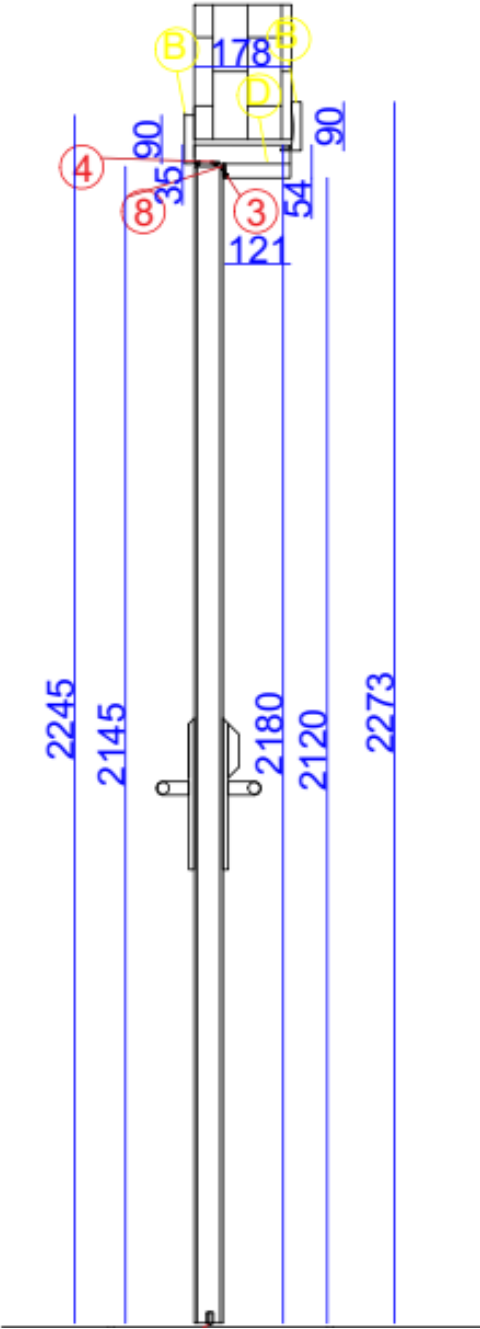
Vertical section view of the Door Nr.1 and the Door Nr.2.
